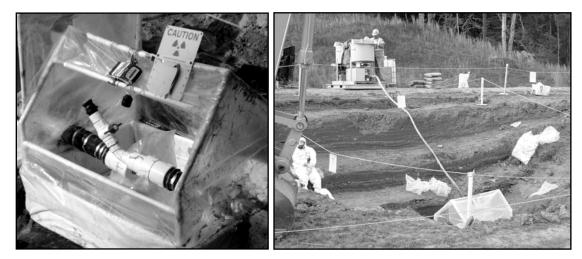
Grout Fittings (*left*) and Grout Set-Up (*right*)
